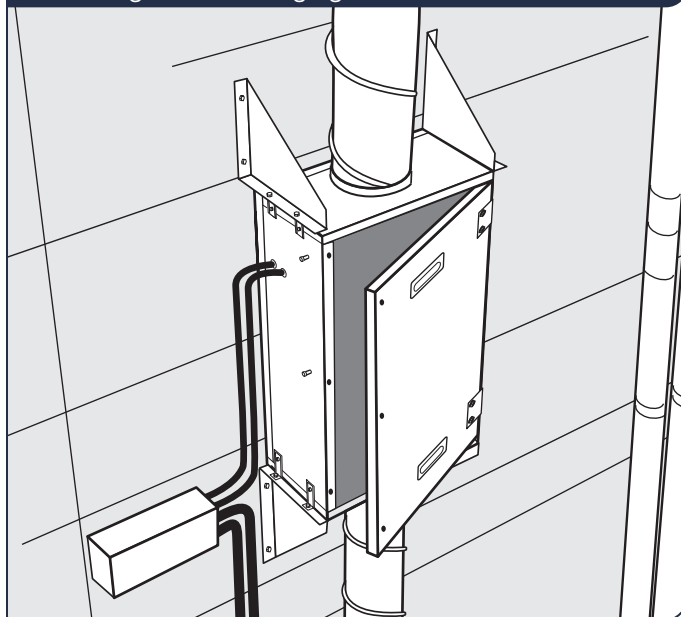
Front Access of Vertically, Wall-Mounted AVS1-6 Unit Using Vertical Hanging Bracket Kit
